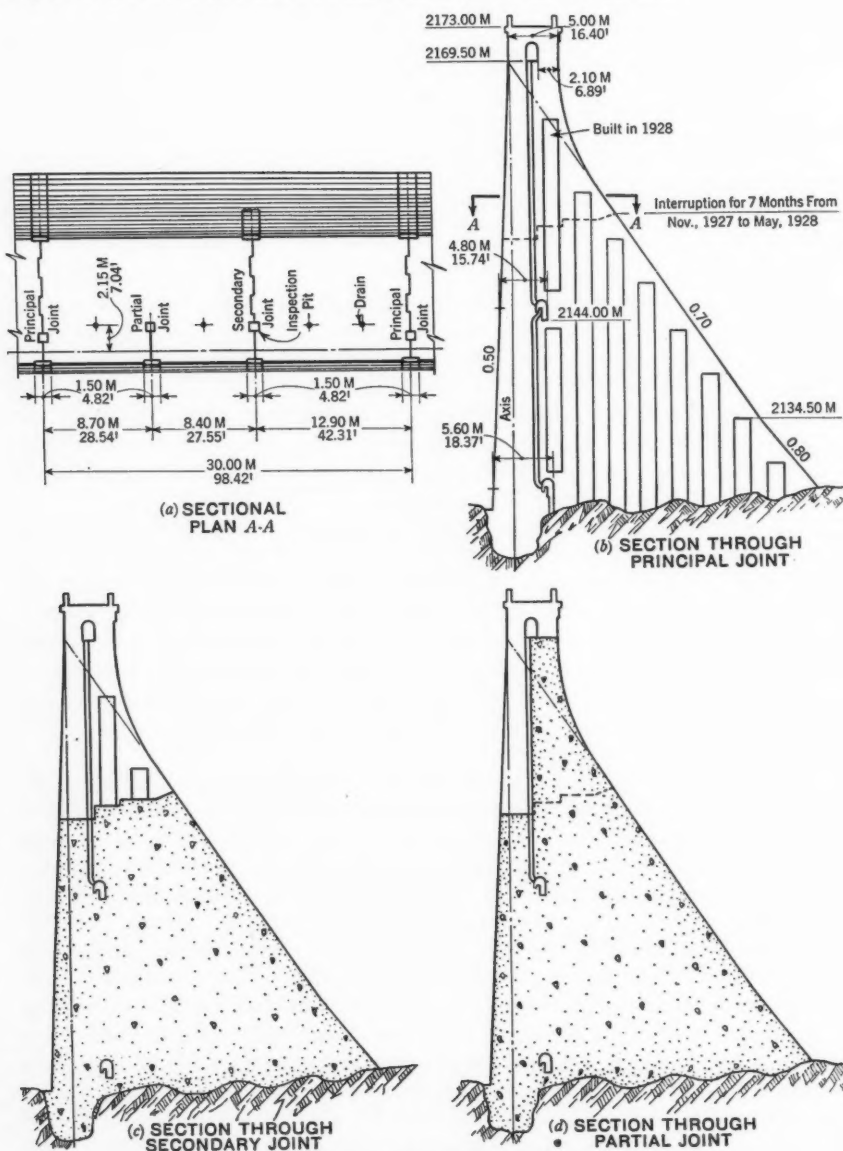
CONSTRUCTION-JOINT LAYOUT—CIGNANA DAM
